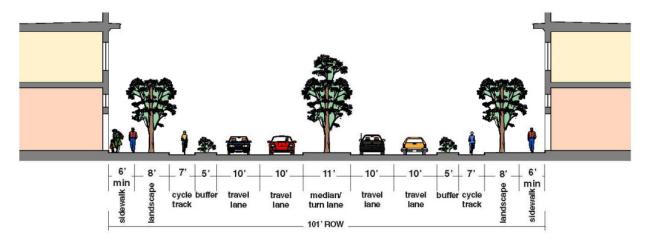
Avenue Sample 2: Protected Cycle Track and Multi-Lane Street Section.
